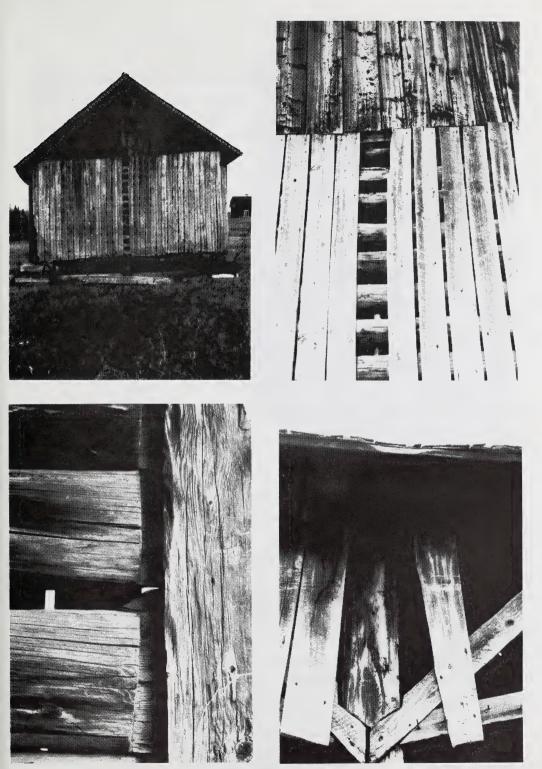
Top, varied wood tone of south elevation (left), and detail showing dowel pegging. Bottom, log wall to post connection at northeast corner (left) - note wedge closing gap between logs, and central post of east elevation - note notching at knee brace. (Field Photographs, Chernochan Machine Shed, Sonia Maryn.)
